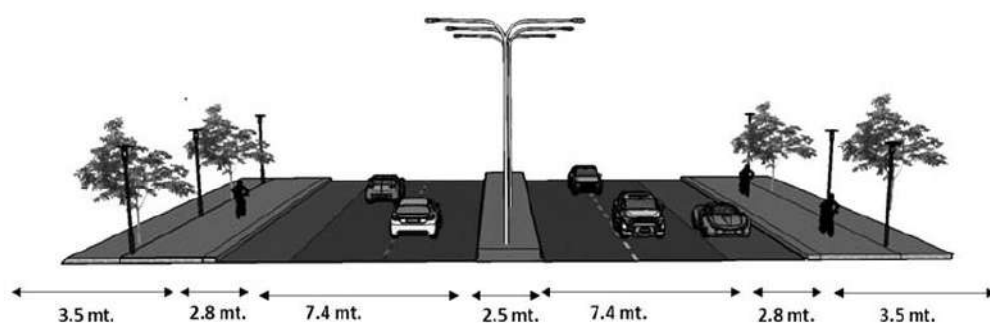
Cross Section of 30m wide Sub-Arterial Road
